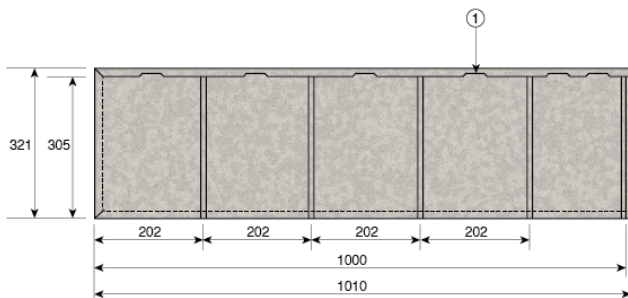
MetalWorks® StoneCrest® Steel Shingles
